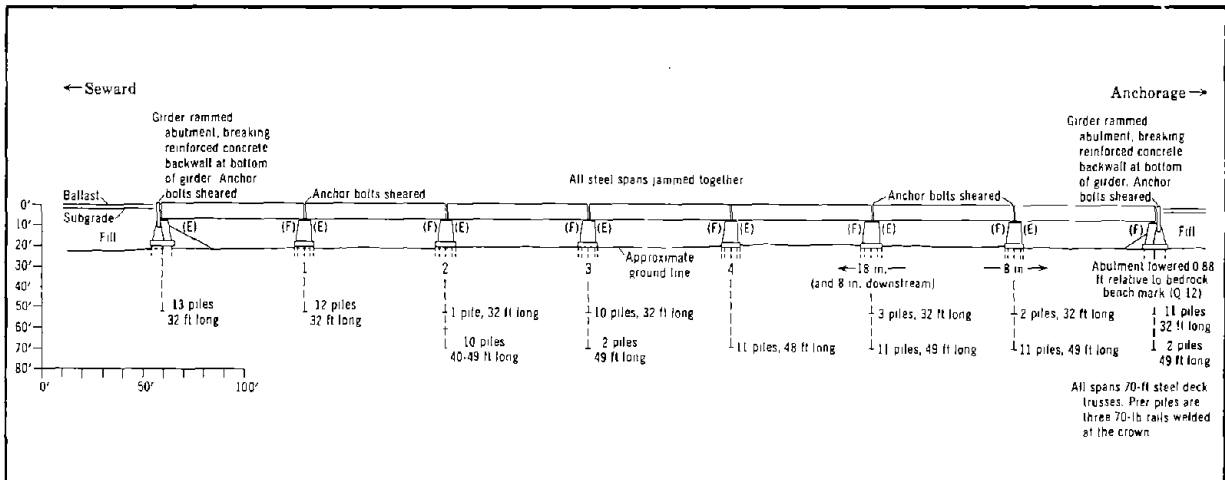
Construction of and Damage to Twenty Mile River Bridge (after McCulloch and Bonilla, 1970).
